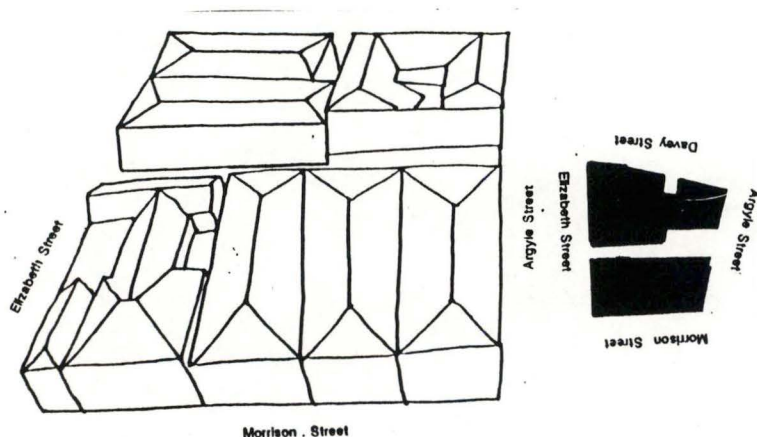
Possible development of Civic Square Site which reinforces the street edge, figure ground shows possible through site link
